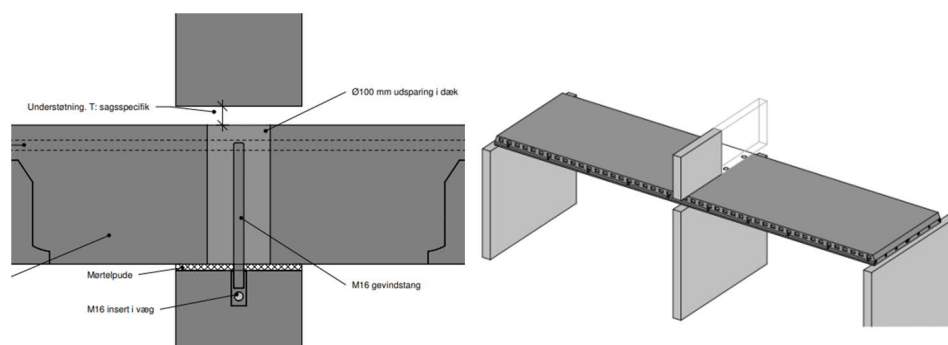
Double-long slab connection: detail (left); perspective view (right); (Abeo A/S, n.d.)
